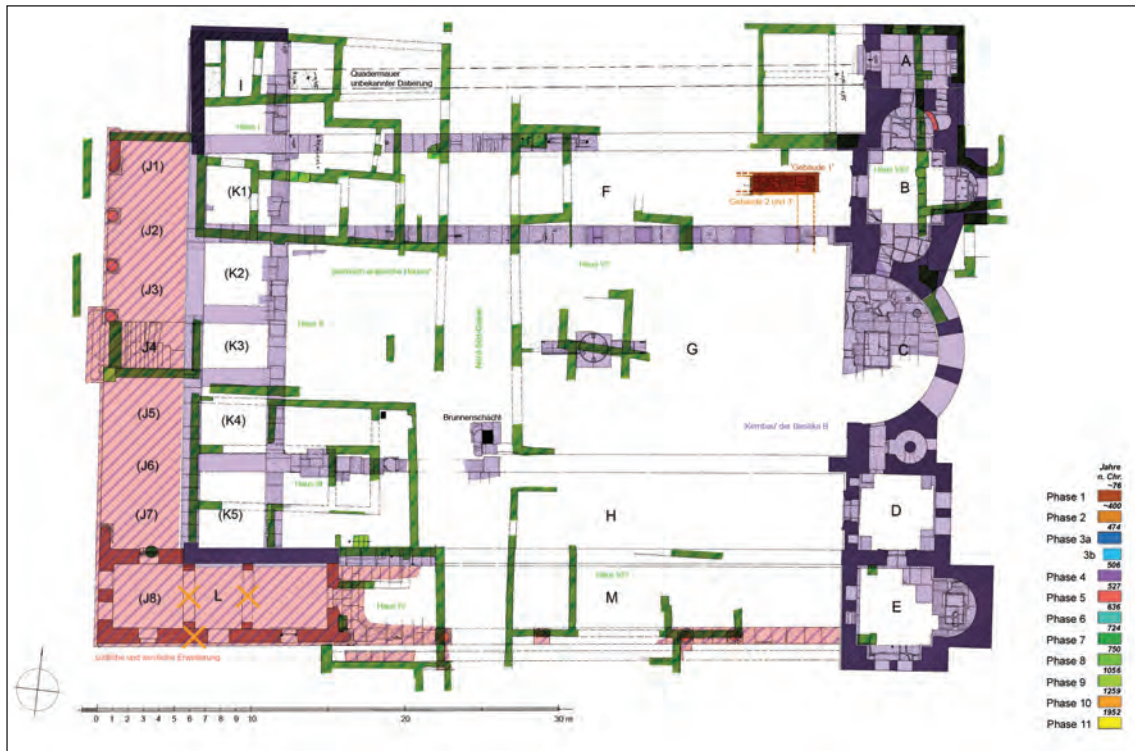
Resafa, Basilica B, provisional chronological plan with previous and subsequent buildings (redrawn and revised plans from the published and unpublished original plans from Wolfgang Müller-Wiener and the excavation plan from Michaela Konrad 1992, Fig. 1b). Mapping of the building phases according to relevant city building phases, Dietmar Kurapkat 2008.
